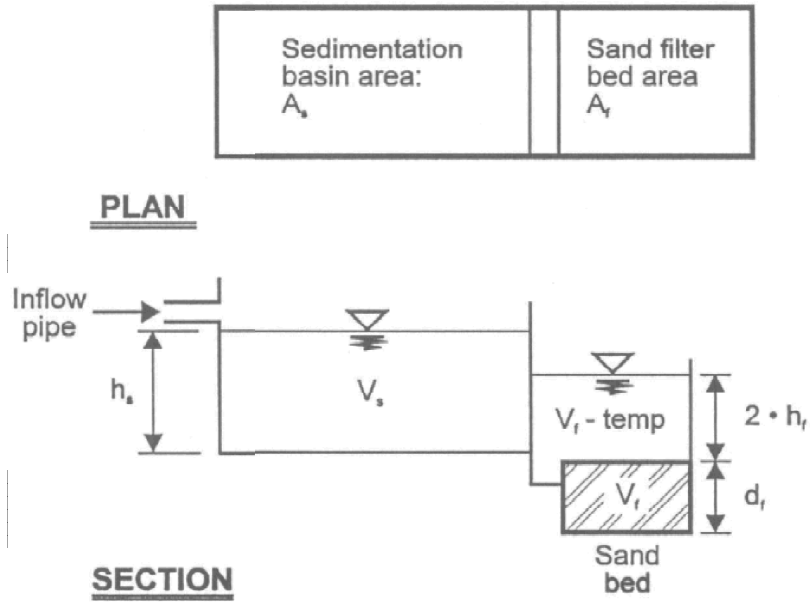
4 Surface Sand Filter (cross sectional view)
